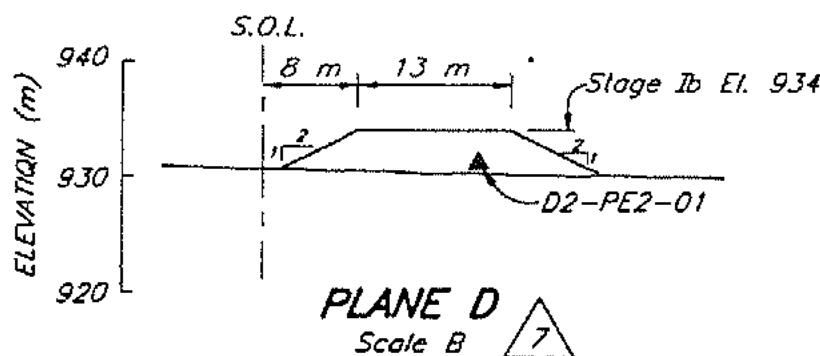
PE As-built (Instrumentation Section), Stage I(b)
